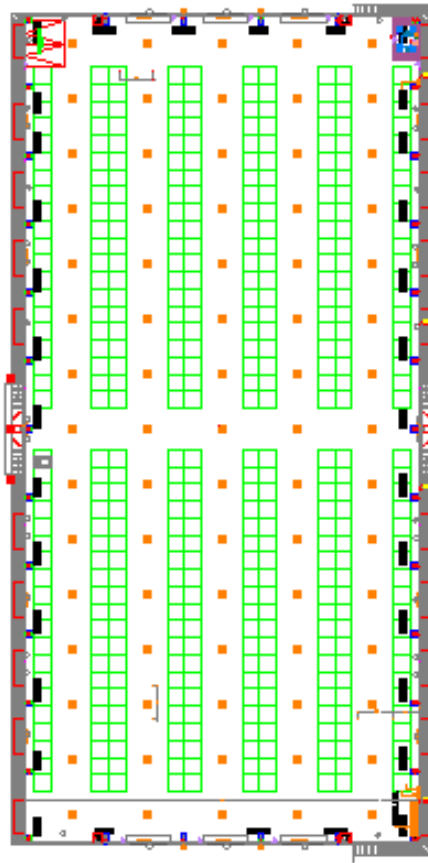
Typical Plan Layout of Cargo Storage Area
